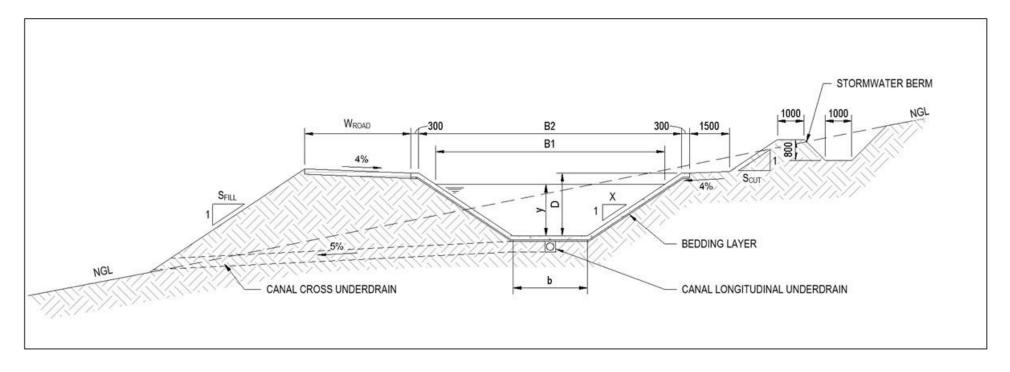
Trapezoidal canal cross-section (Types T1 and T2)
